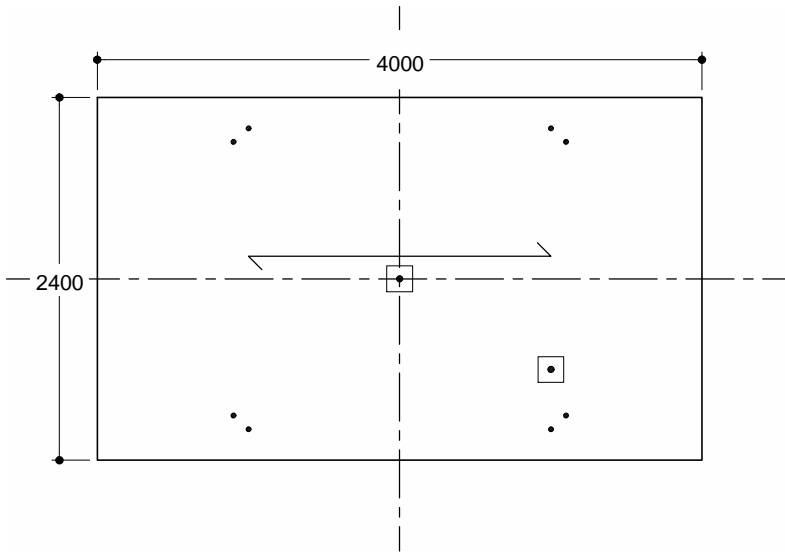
One-way long span balloon construction (Assemblies J and K)
